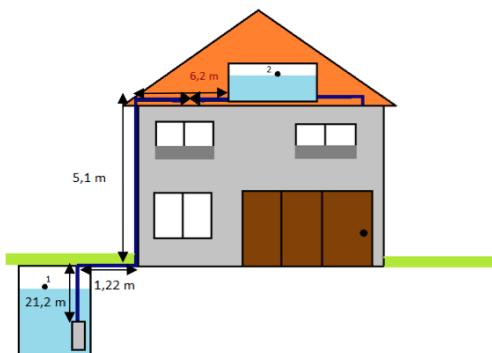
Scheme of a water supply system: from a hole (20 m deep) with a submersible centrifugal pump to a reservoir in an independent 2 floors' house (Cerdeira, Saraiva, and Carmo, 2014)
